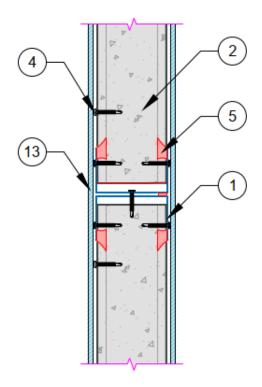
Back-to-back C-track connection in dual stack wall with 6 mm fibre cement lining
